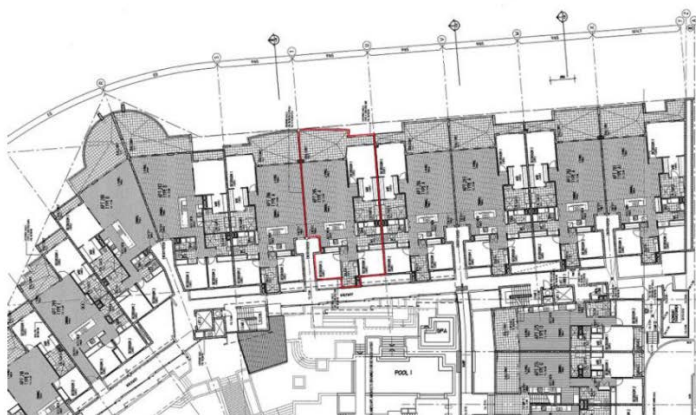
Unit 205 (lot 18) as extracted from approved plans for ‘the beach’ Major Project approval (DA03/1221)
